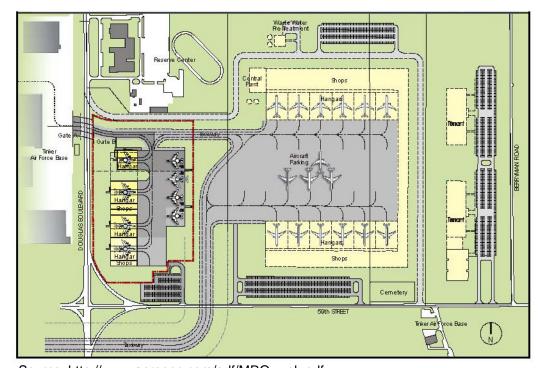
Oklahoma MROTC Master Plan — Full Development
